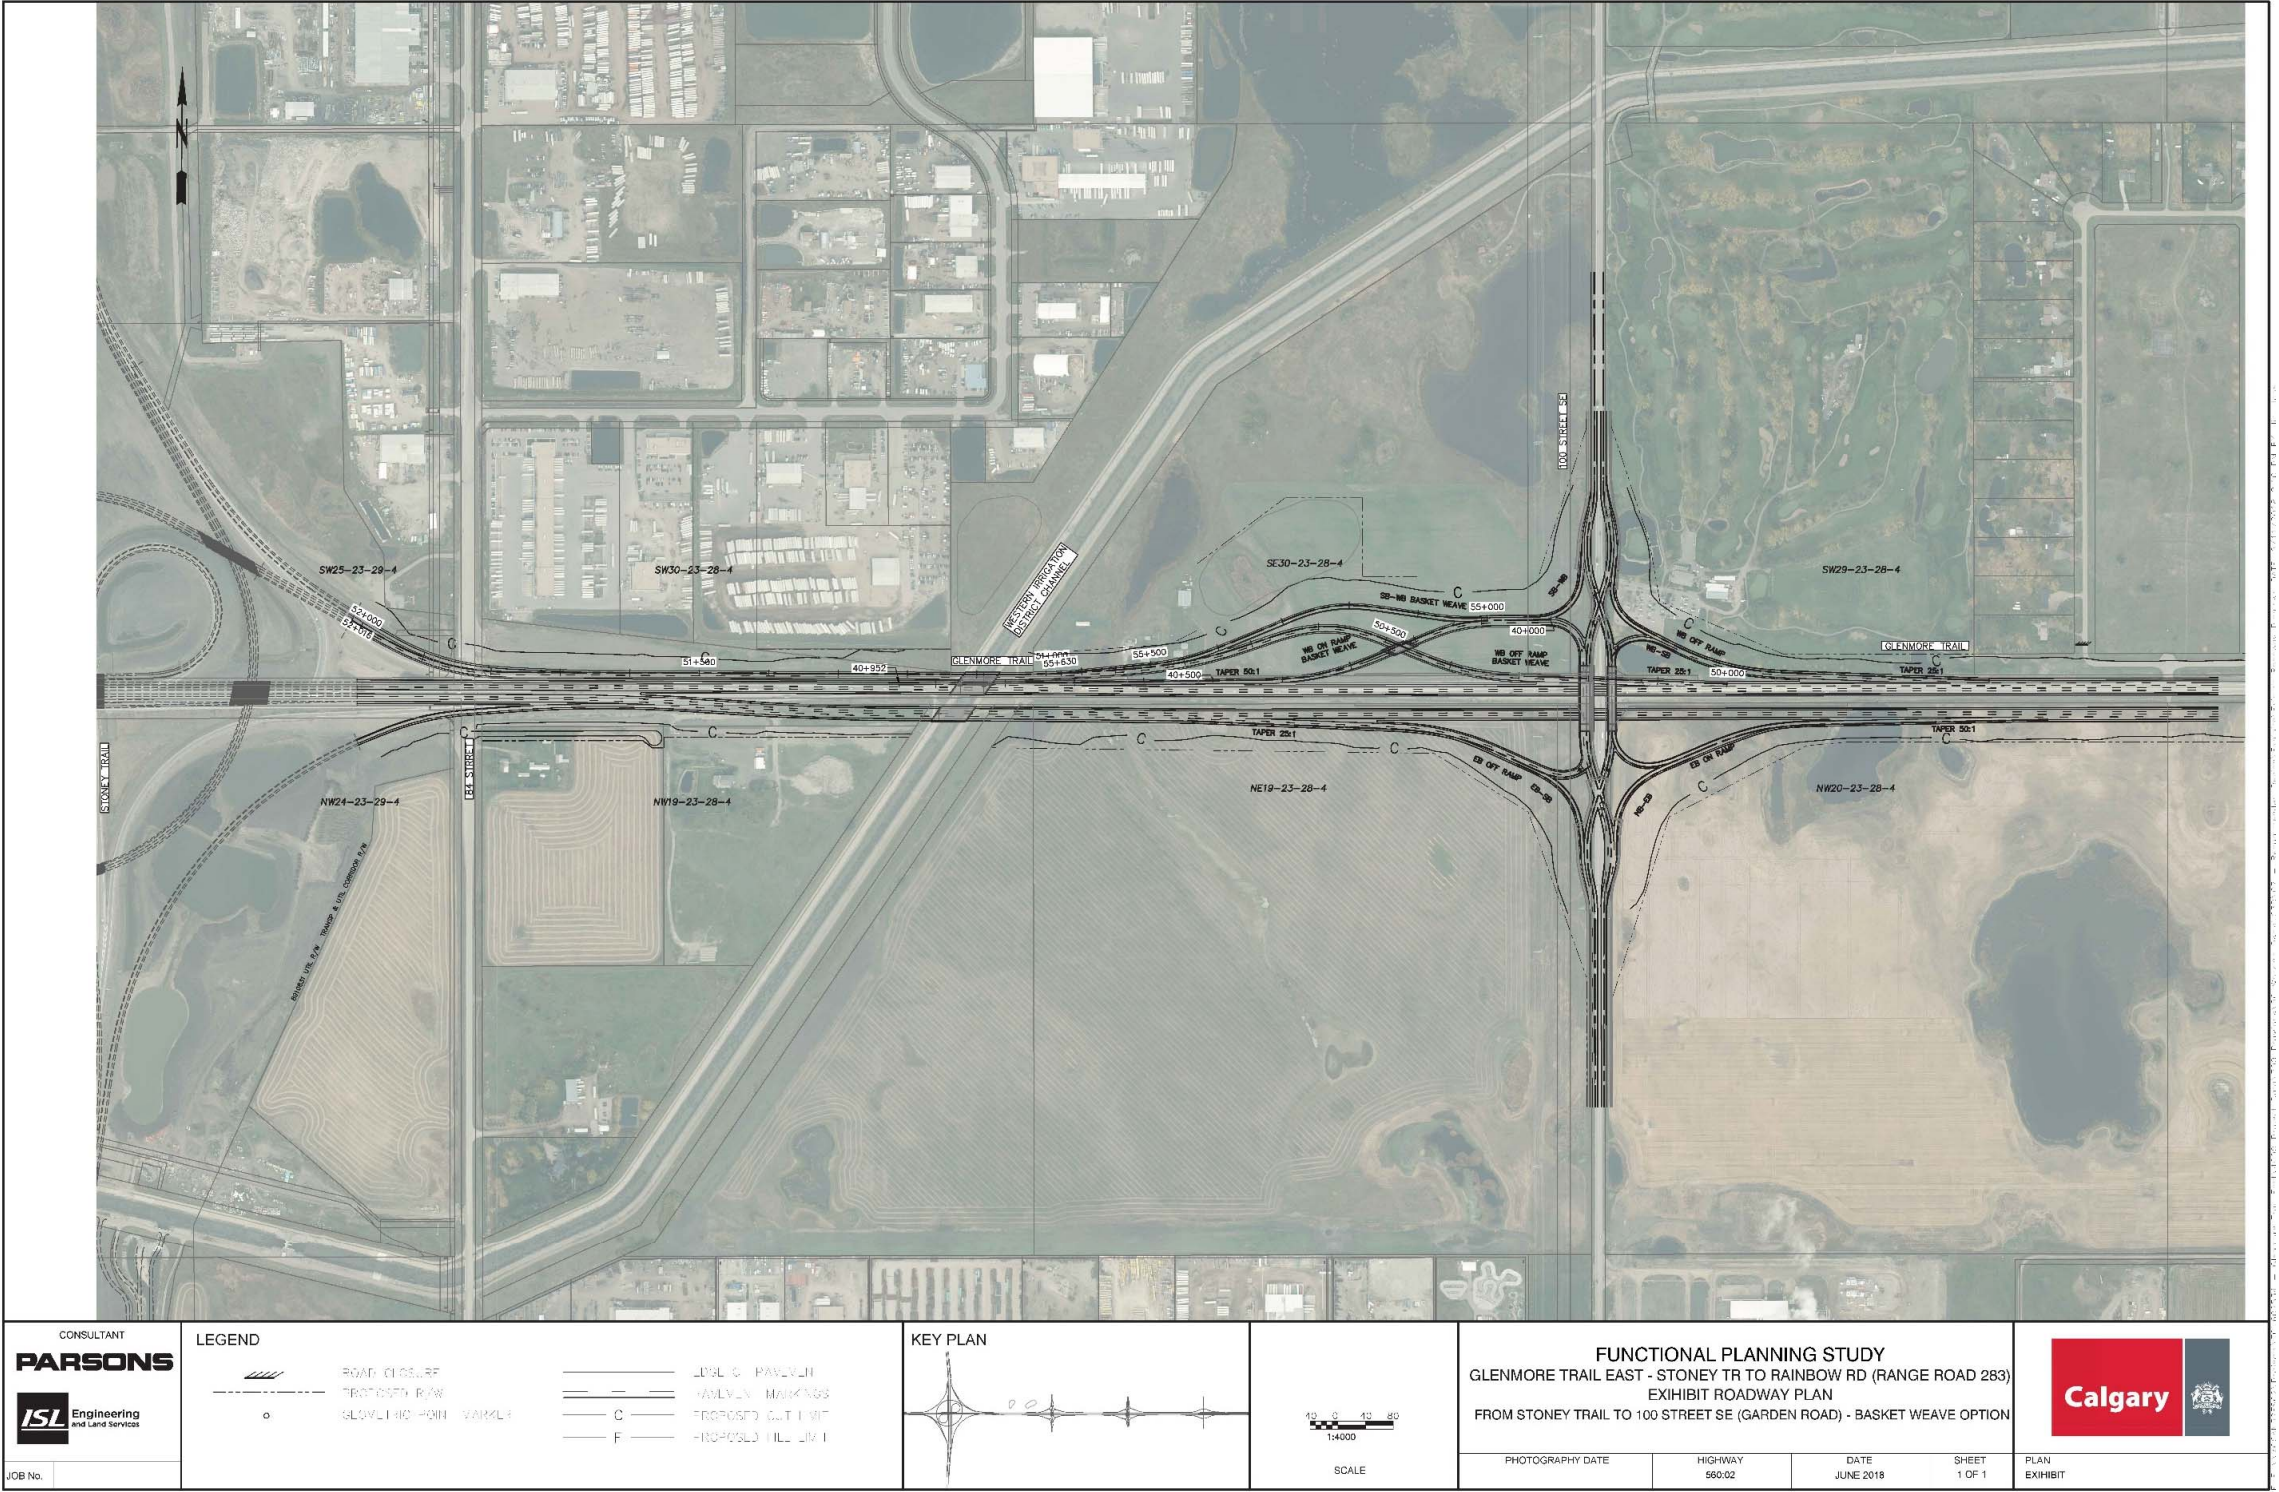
RECOMMENDED PLAN - BASKETWEAVE OPTION
